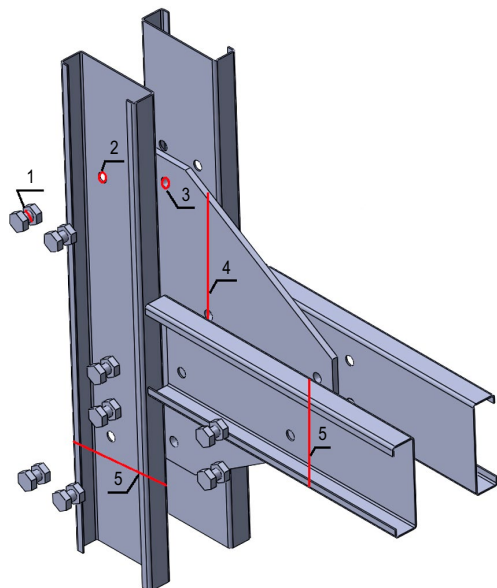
Exploded view of beam-to-column connection with failure modes marked in red
